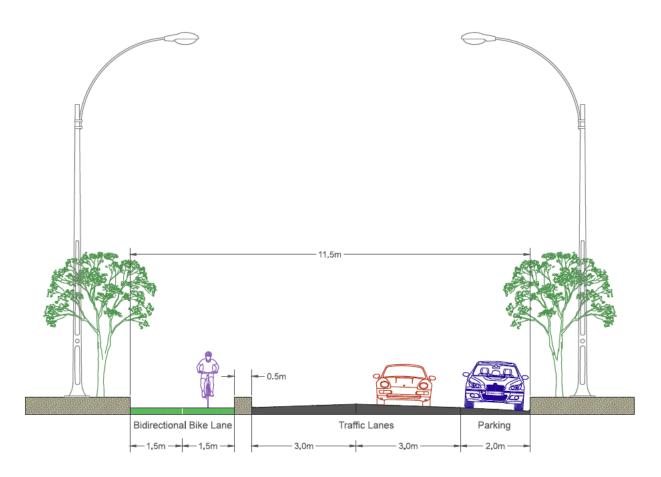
Potential bidirectional cycleway on Mary Street, looking west.
